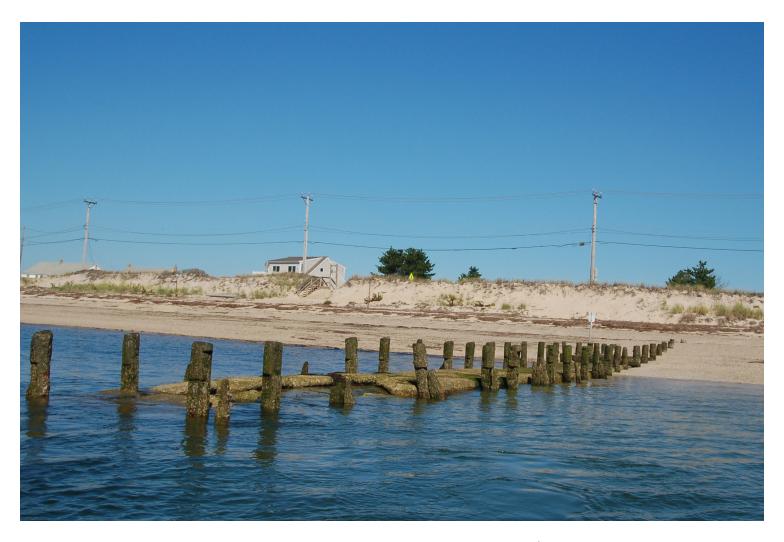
| The outfall pipe of the East Harbor culvert, owned by the Town of Truro..
